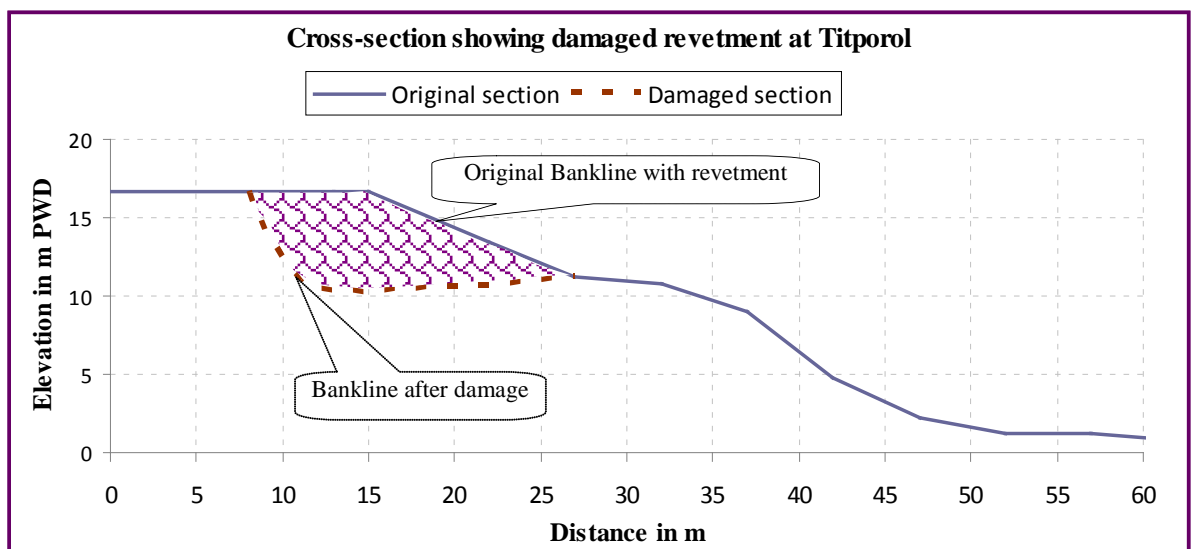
Cross-section showing typical bank failure of Titporol Revetment
